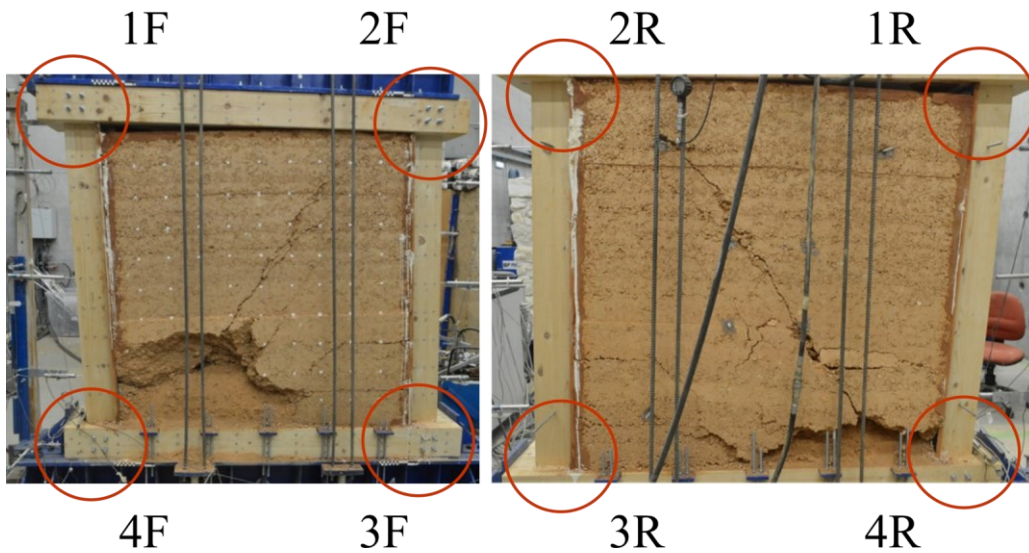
TREP4 test – Highlight of the damage in the rammed earth panel: (a)front view; (b)rear view.
